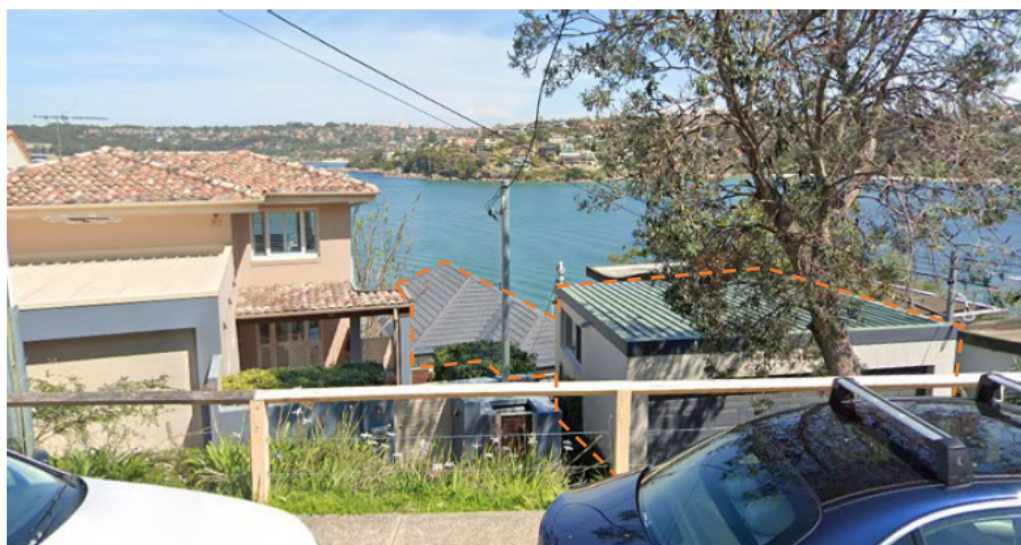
View overlooking subject site from Cutler Road. It is considered that the views are retained for adjoining properties as the proposed roof will be lower in height to the existing. (Google Maps, 2018)
